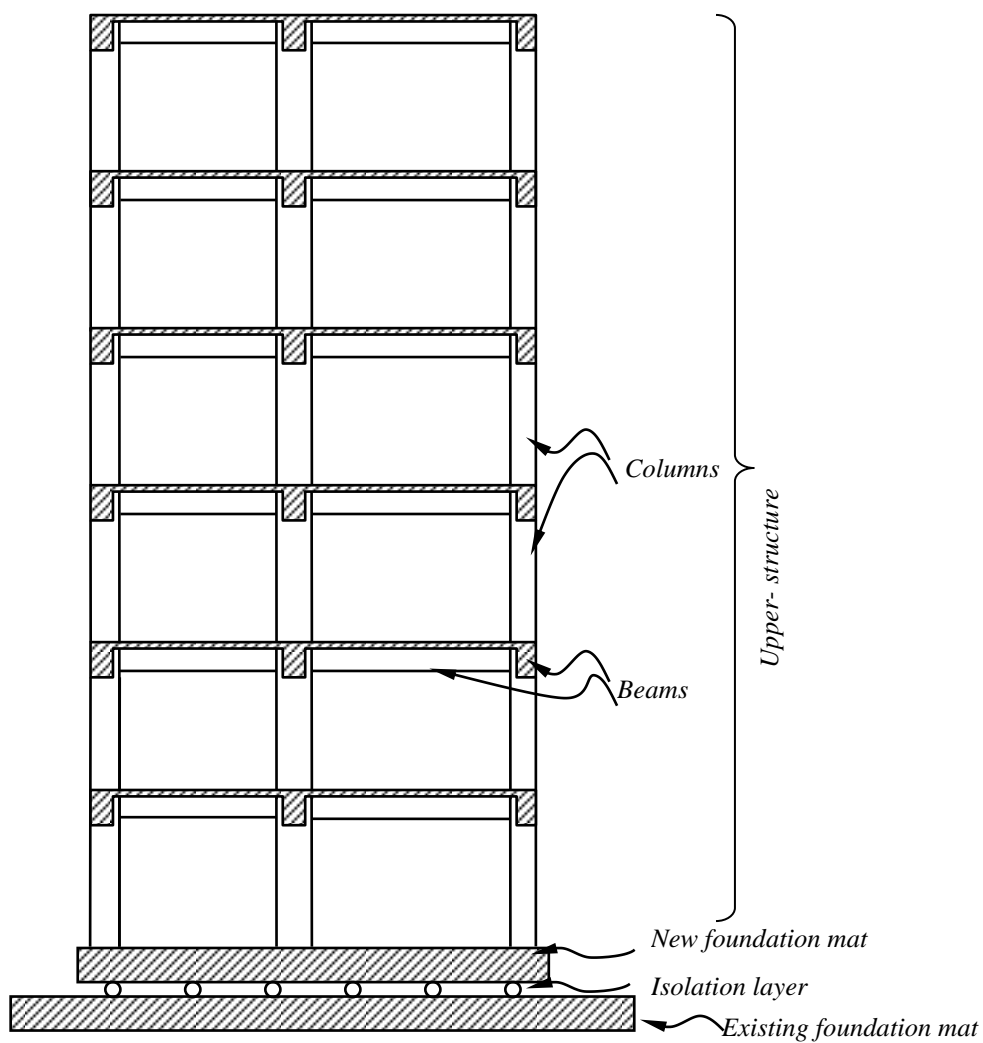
The use the existing foundation mat as the foundation for the new buildings – simplified representation
